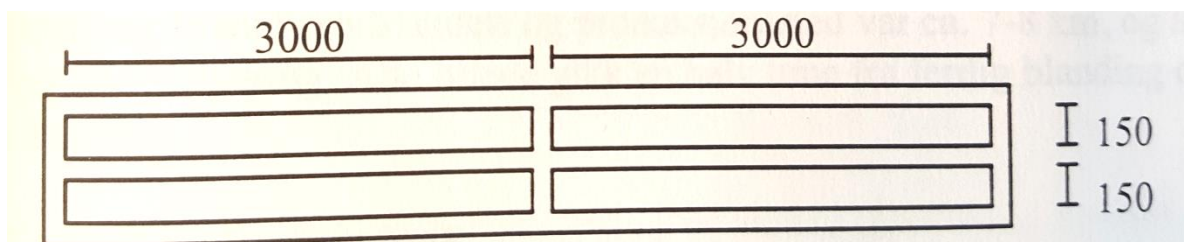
Illustration of formwork for casting of 2 pairs (2x2) concrete beams. Measures in mm [12]
